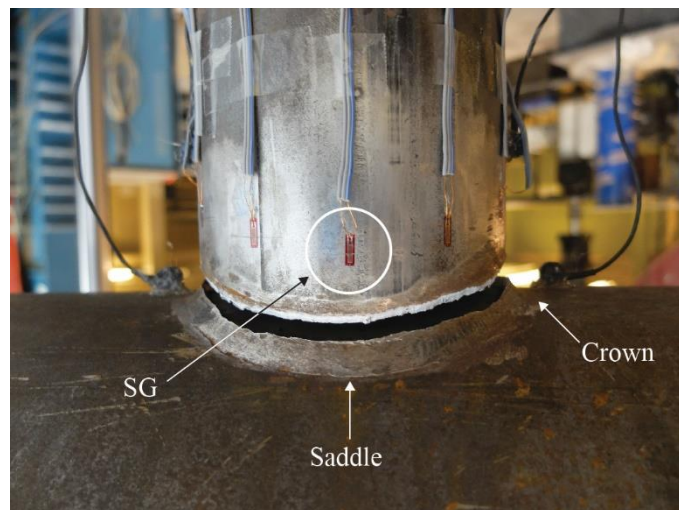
Strain gauges near weld toe (and weld fracture) in test 127-273-90a
